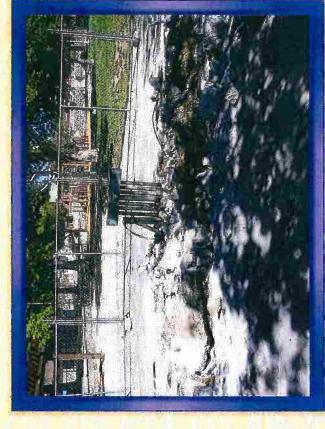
PHOTOS OF ANCHOR CONCRETE WORKING AT 1700 PRATER WAY, SPARKS NEVADA AT THE DEER PARK RESTROOM FACILITY
